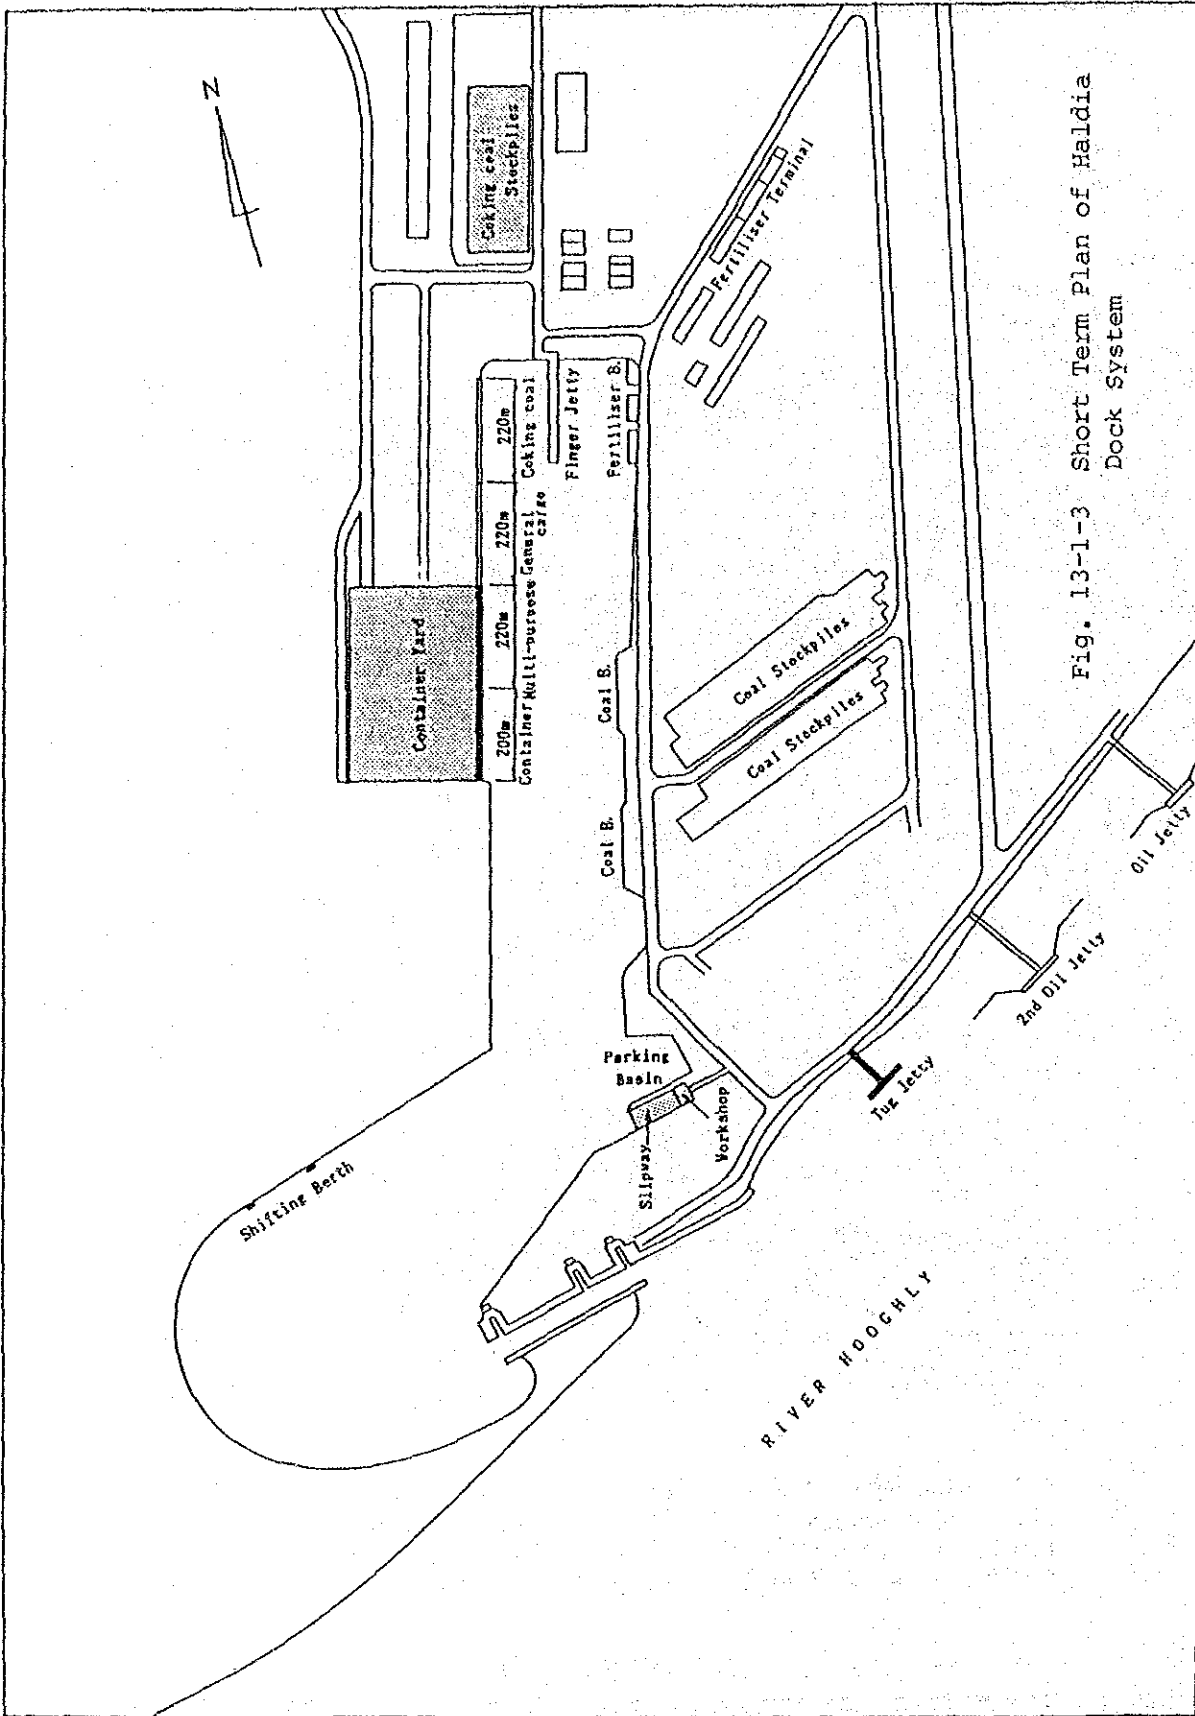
Short Term Plan of Haldia Dock System
